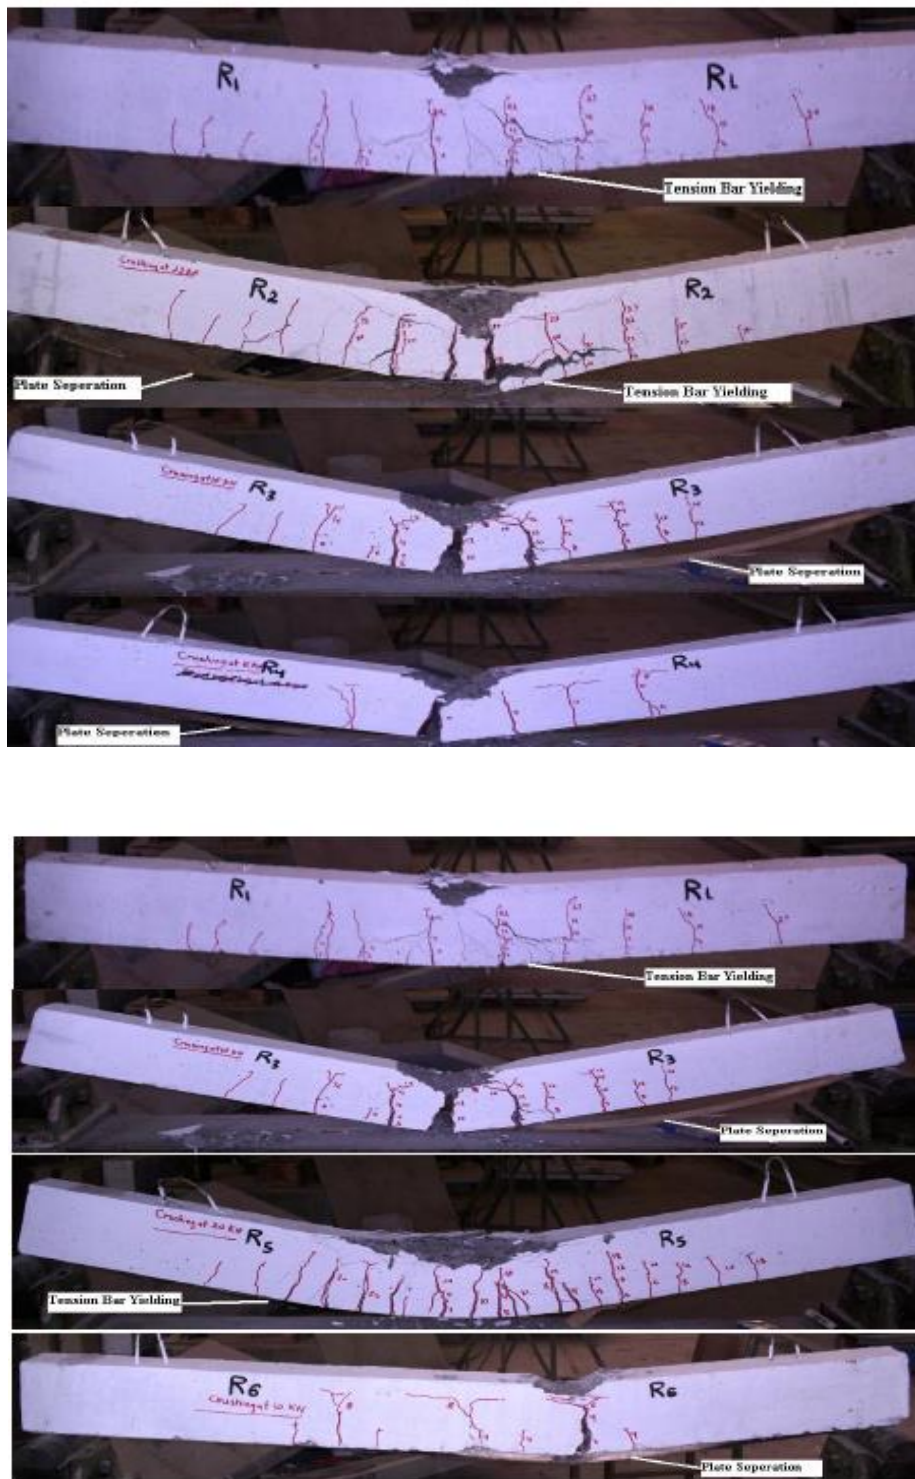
Beams specimens Figure 2.19 Details of the Reinforced concrete beams (Ajeel, Ghedan, & Hamza, 2011)
